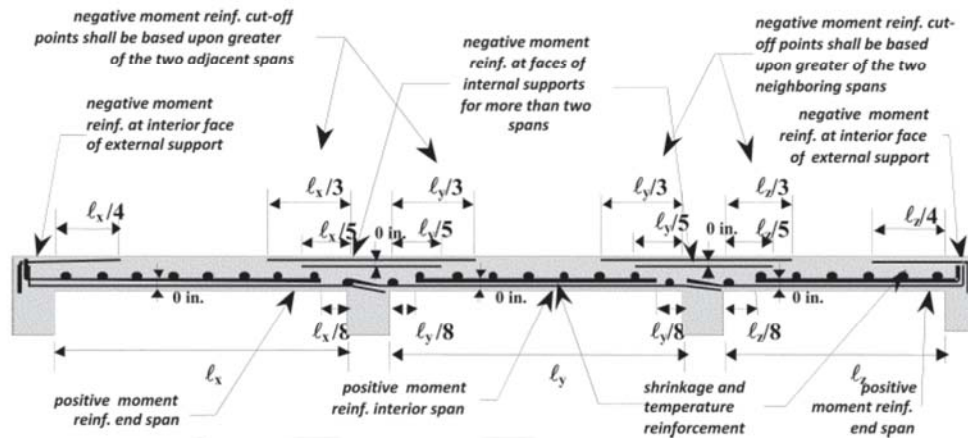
Reinforcement for one-way slabs supported by girders, beams, or reinforced concrete walls, with three or more spans.
